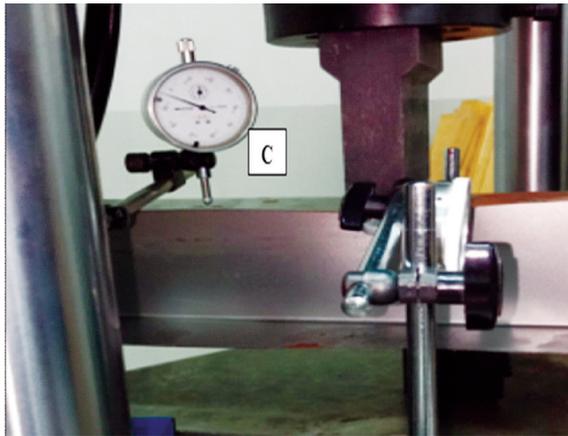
Assembly of dial gauge 'C' on the designed beam.
